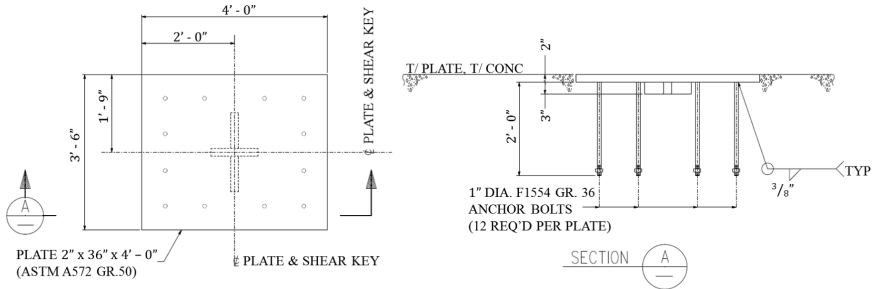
Example embedded plates with shear keys and headed bolts
